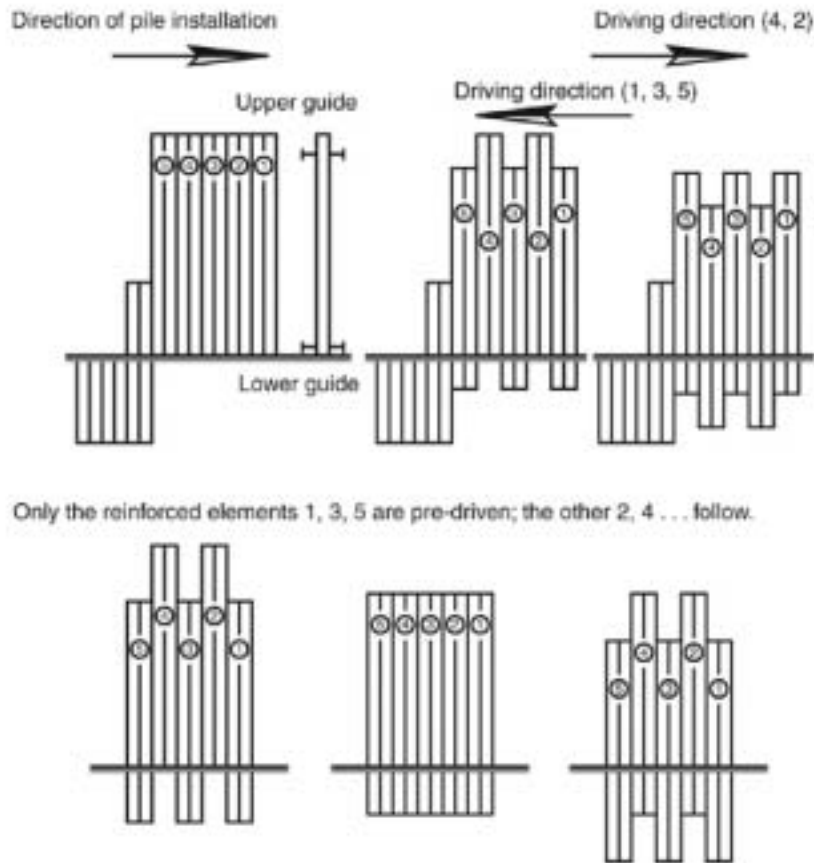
Staggered Driving – The driving of steel sheet piling can be staggered to advance the pile toe with decreased risk of damage or refusal.
